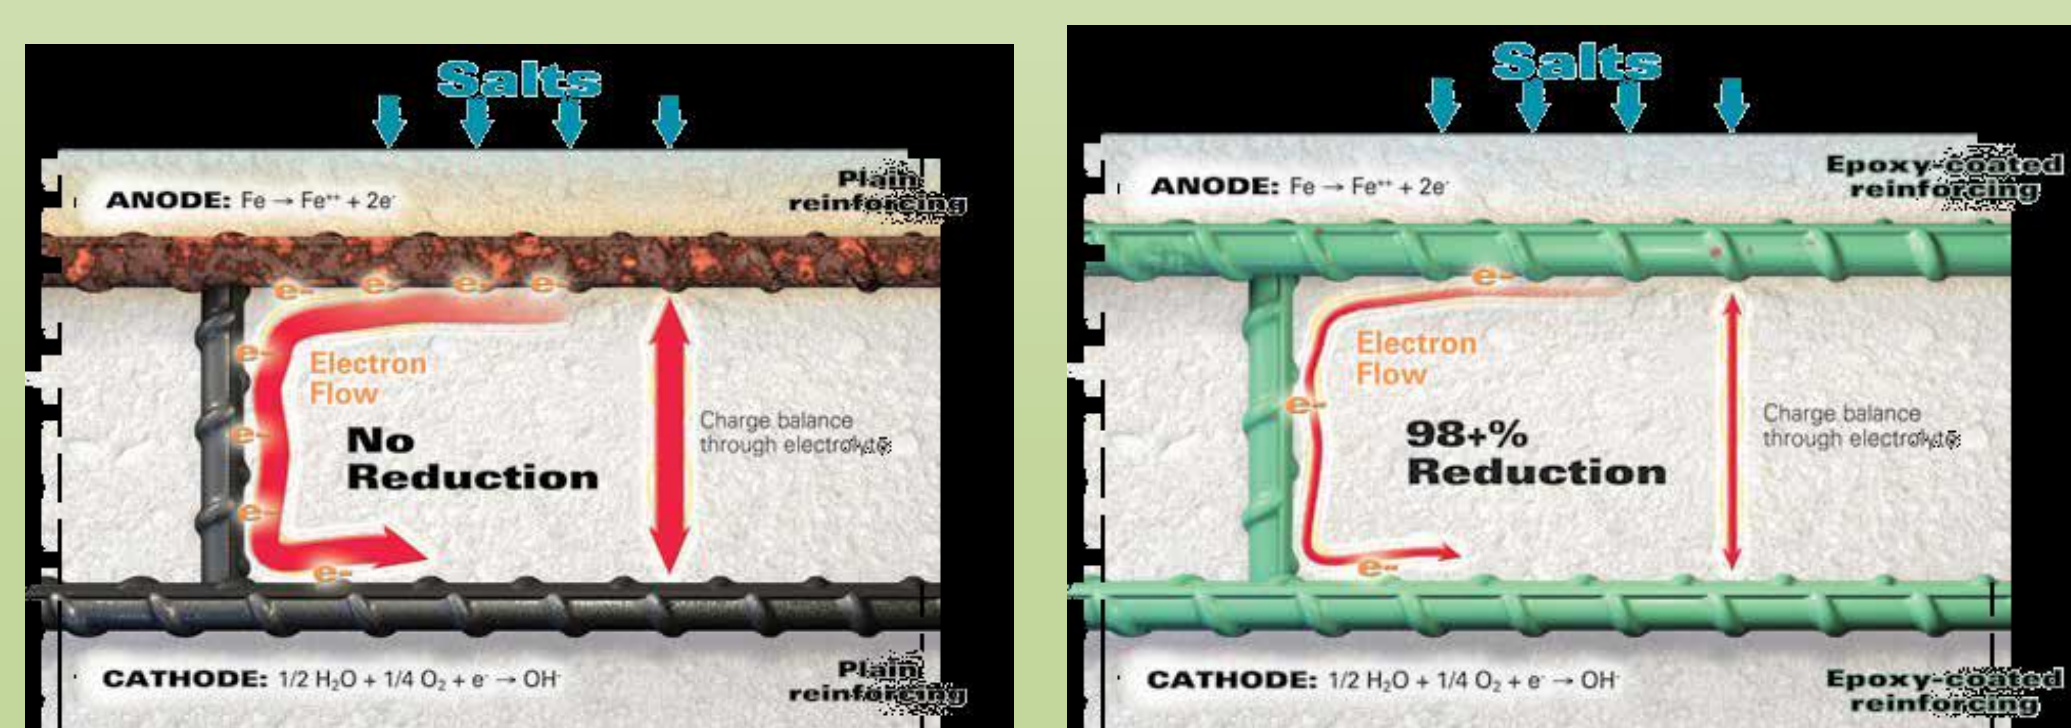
a) Schematic of corrosion process in reinforced concrete. b) Epoxy coated rebar do not allow such reaction to occur even with Cl⁻ present in concrete.
